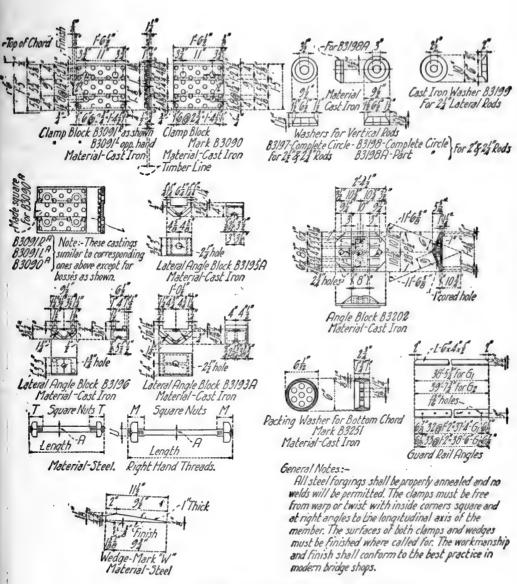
Iron Details for 150 ft. Span, Howe Truss Span. C. M. & P. S. Ry.
